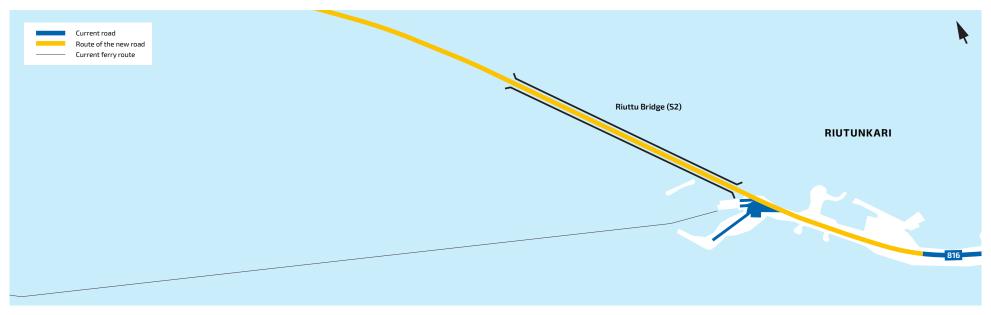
Riuttu Bridge (S2) and the route of the new road.
